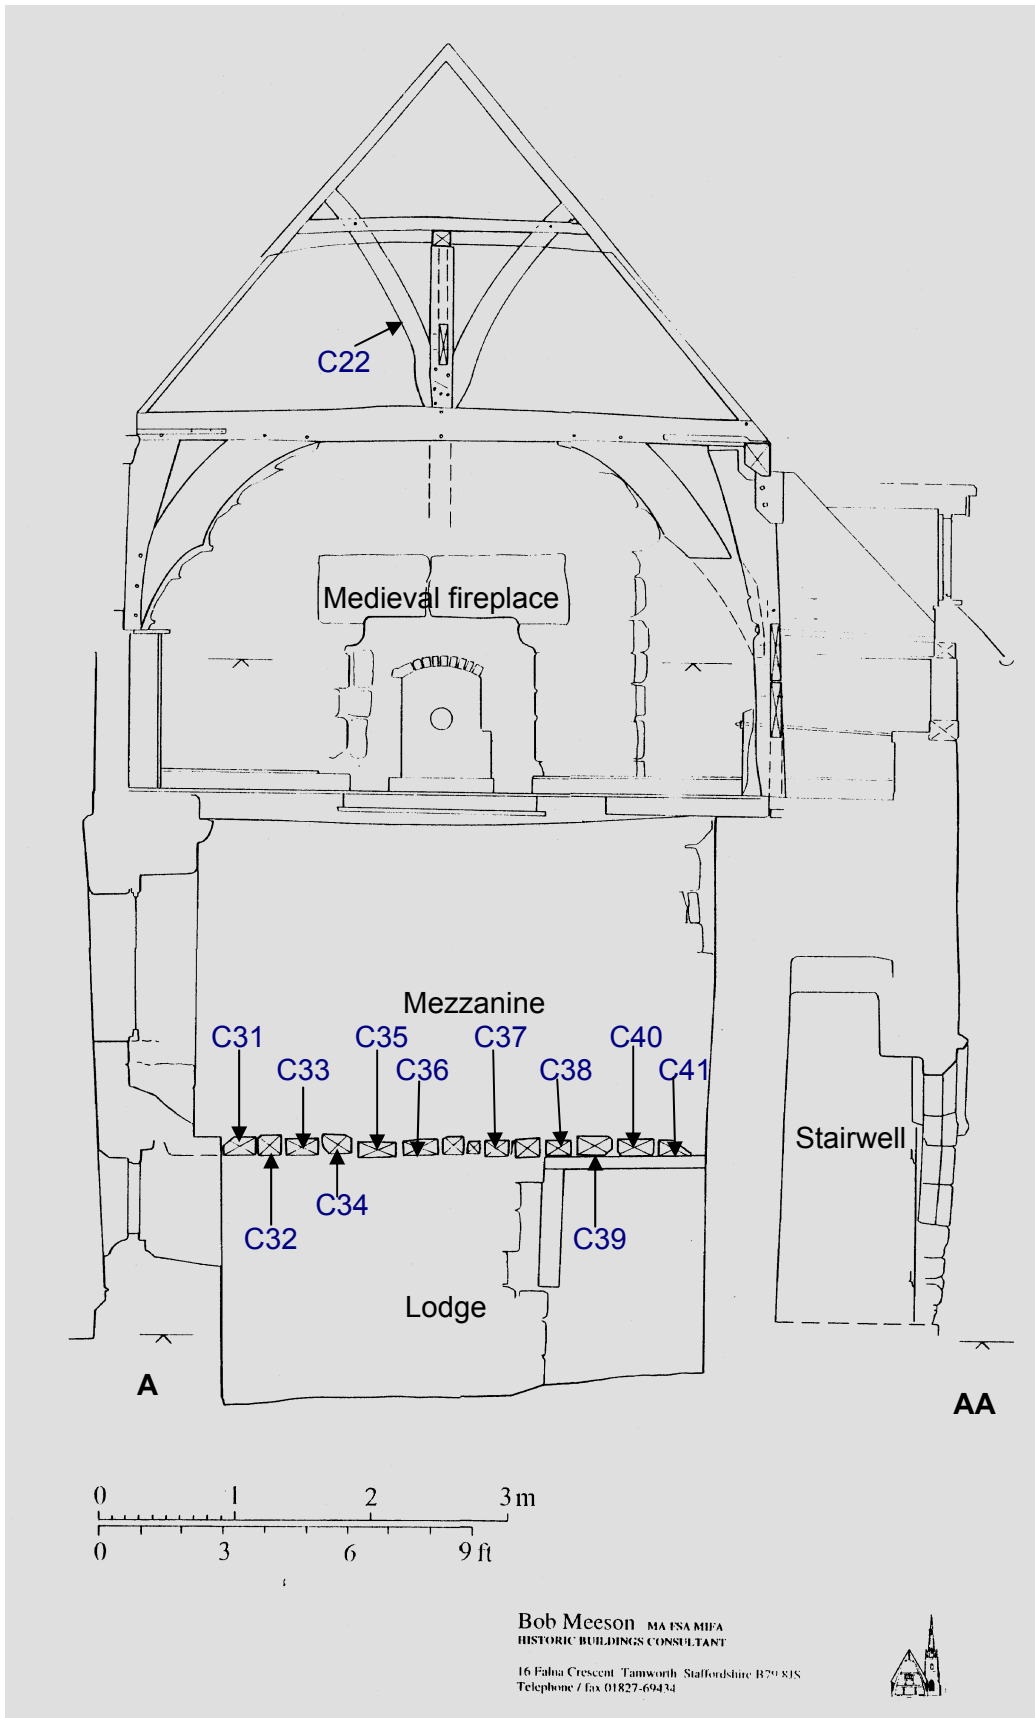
Gatehouse; drawing to show sample locations from the mezzanine floor joists and roof (viewed looking east) (after Jean and Bob Meeson)
